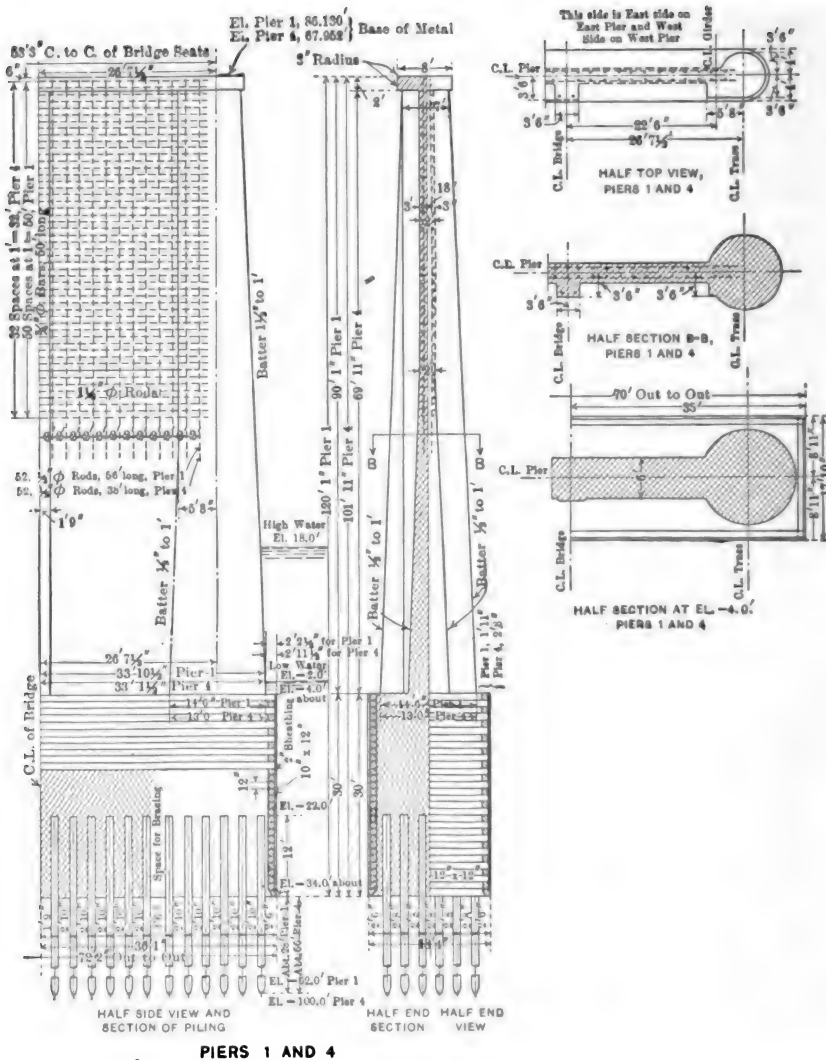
TACOMA REINFORCED CONCRETE PIERS.
